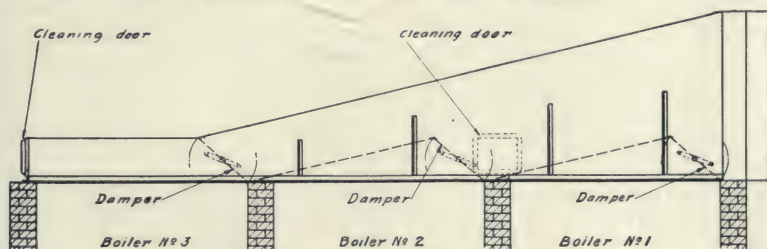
Breeching and Damper Arrangement for a Battery of Boilers.
